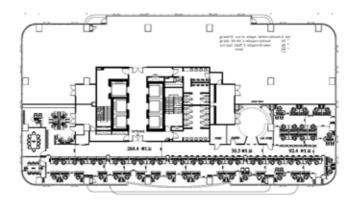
Open plan of fice at Philips Lighting department on the 29th floor, old situation (Ruethaivanich, 2011)
